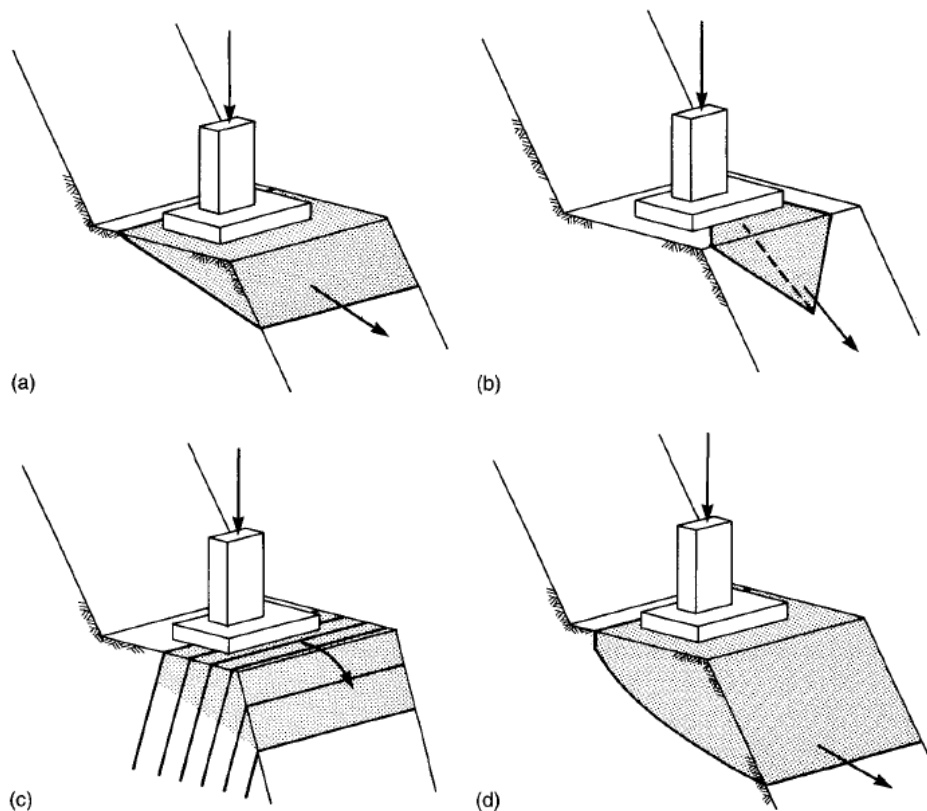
Failure mechanisms (a) planar sliding failure on single discontinuity; (b) wedge sliding failure on two intersecting discontinuities; (c) toppling failure of steeply dipping slabs; (d) circular failure in closely fractured rock (Wyllie [11]) from ÖNORM B1997-1-2, Appendix B
